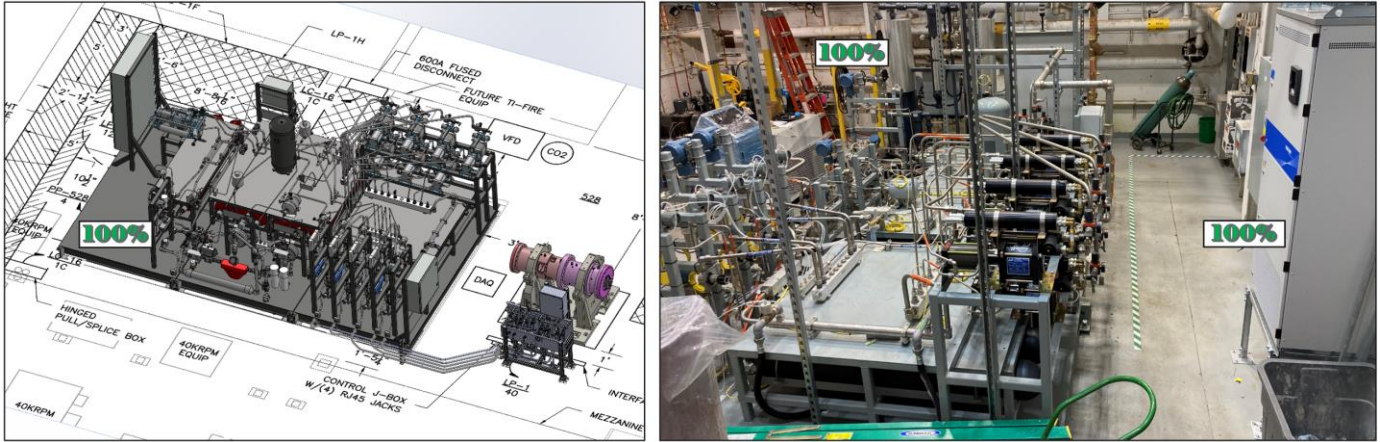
Installed equipment, gas supply skid and motor VFD
